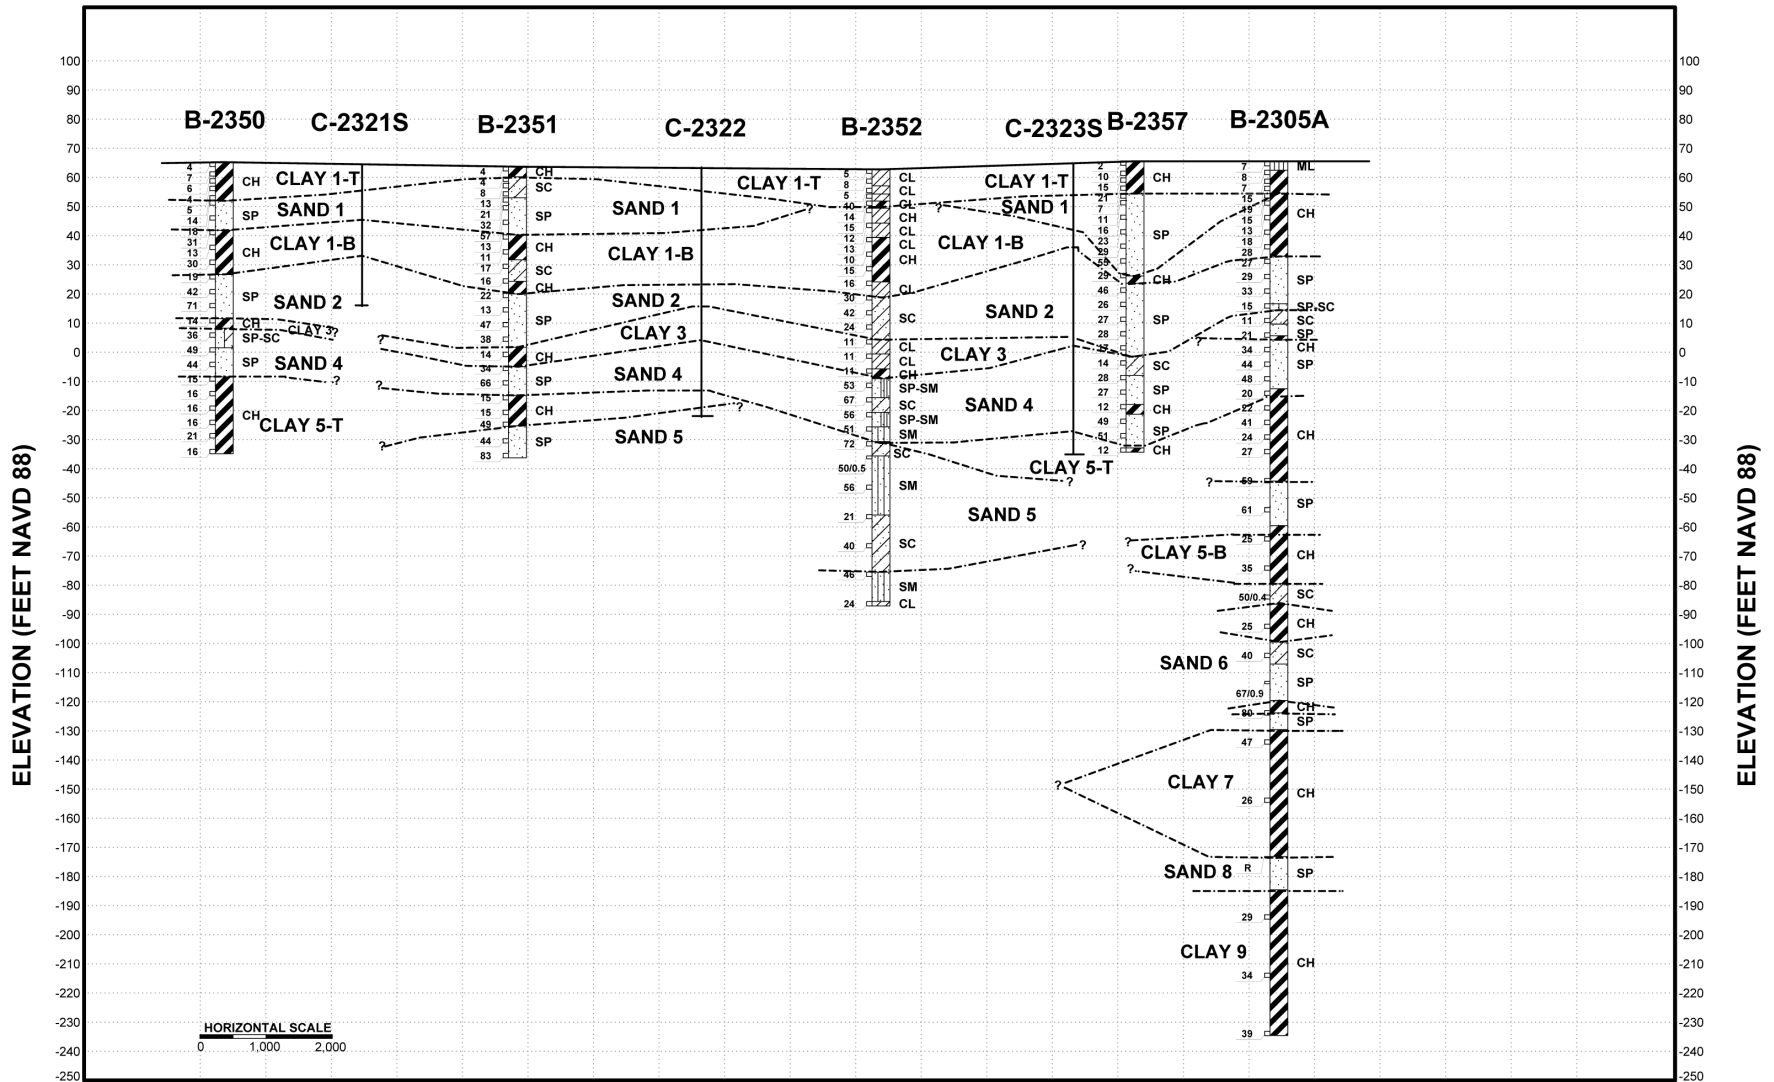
Subsurface Profile K; South Embankment Dam of Cooling Basin/GBRA Storage Water Reservoir (East-West)
